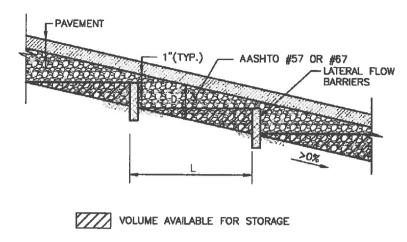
Permeable Pavement Profile, Sloped Installation.
